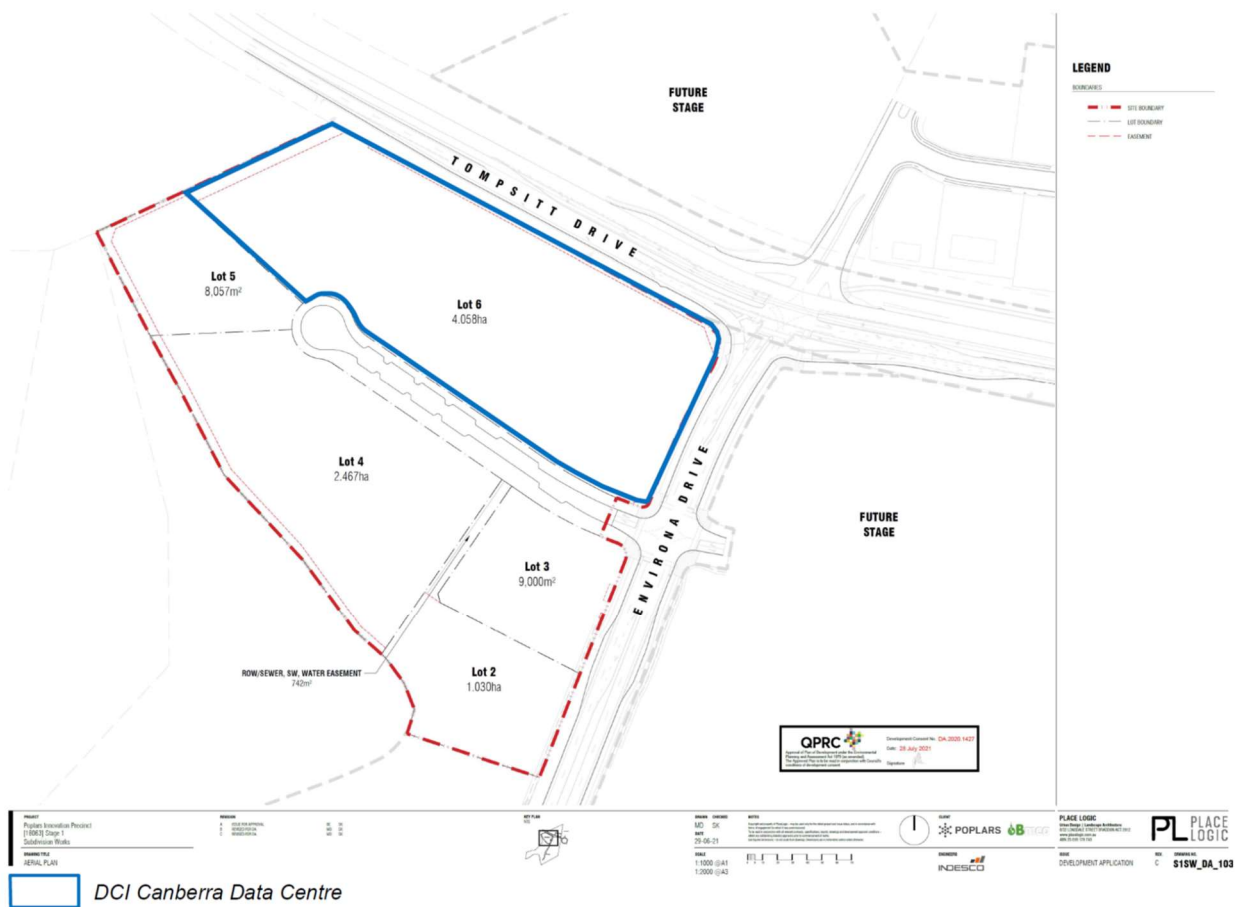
Approved Estate Subdivision Plan (Source: Poplars)
